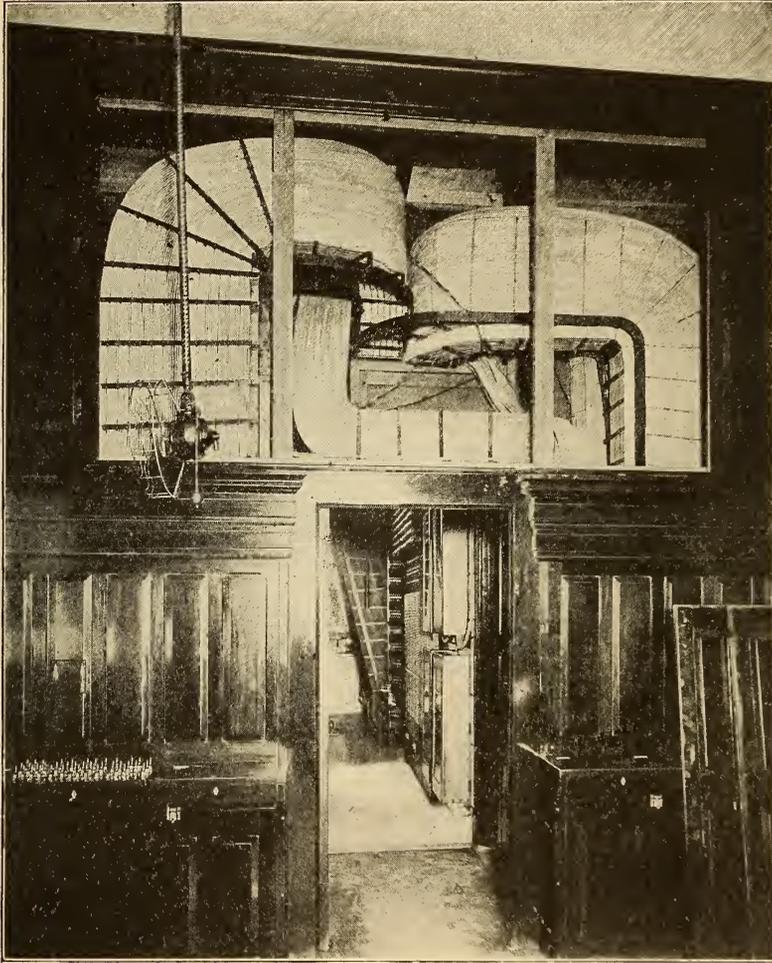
TURNING SECTION—CORTLANDT STREET OFFICE.
